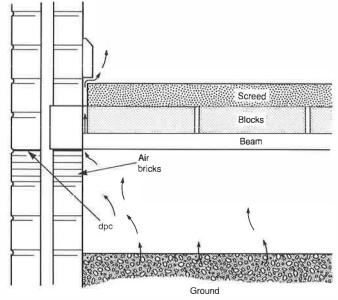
Suspended concrete construction beam-and-block floor: radon entry points
